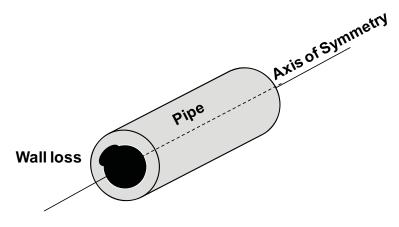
Depiction of non-symmetric wall loss of a pipe
